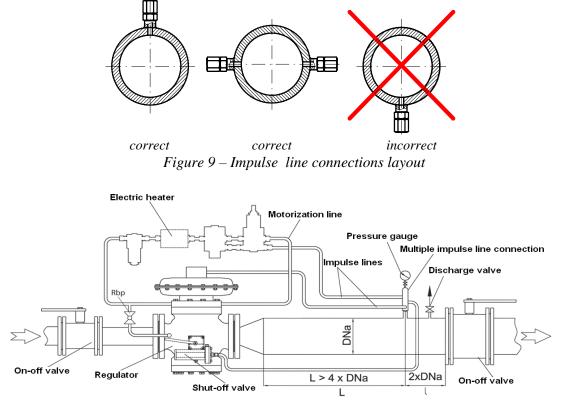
Multiple impulse line connections layout in a horizontal installation
